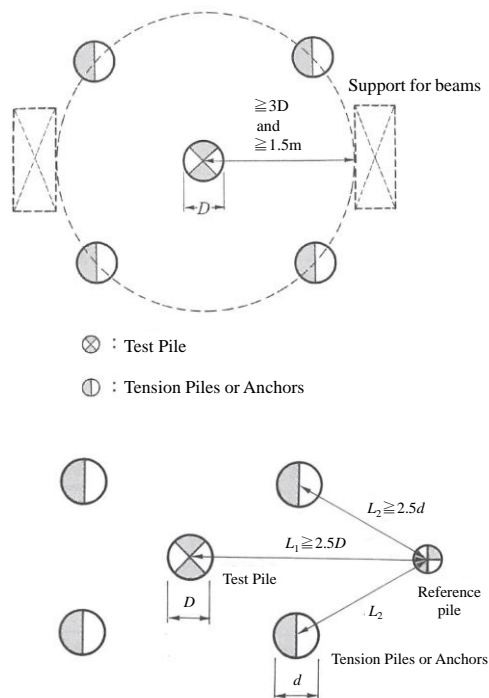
Distance between the support point or tension piles (or anchors) and the test pile.
